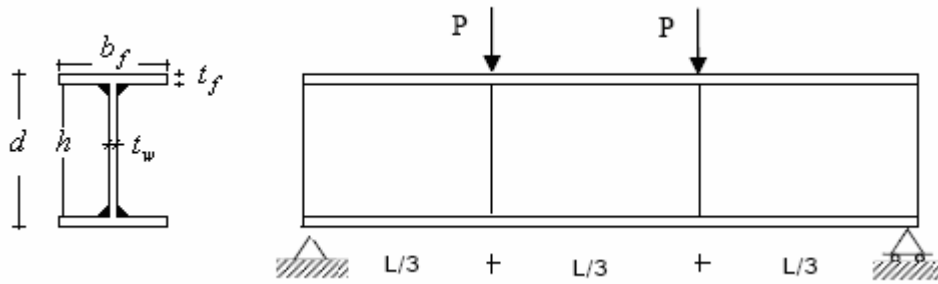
Beam Specimens With Fillet Welds on Both Side of the Web
